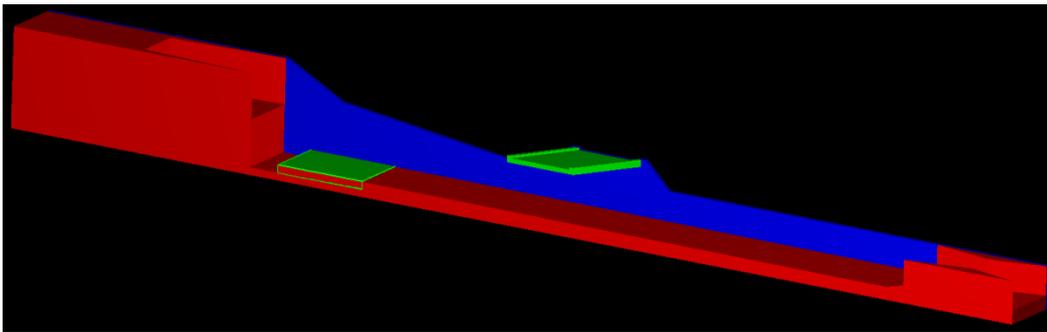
Modified stilling basin configuration (green box highlights existing concrete that would be removed). The near wall of the channel is not shown.
